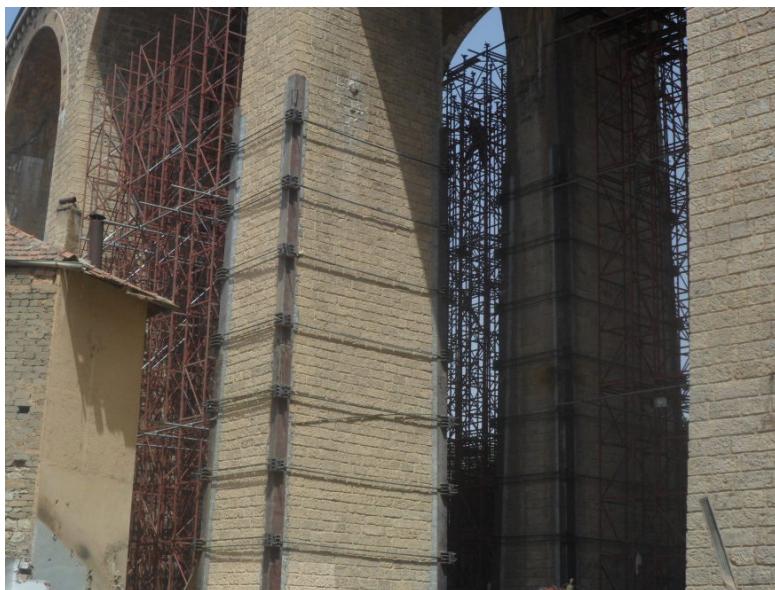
Emergency propping and pier jacketing with steel profiles and external posttensioning
